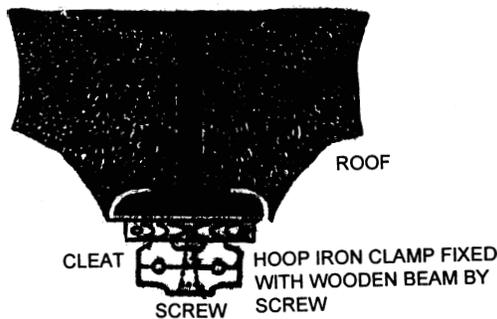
ARRANGEMENT FOR DRAWING WIRES UNDER IRON BEAM
